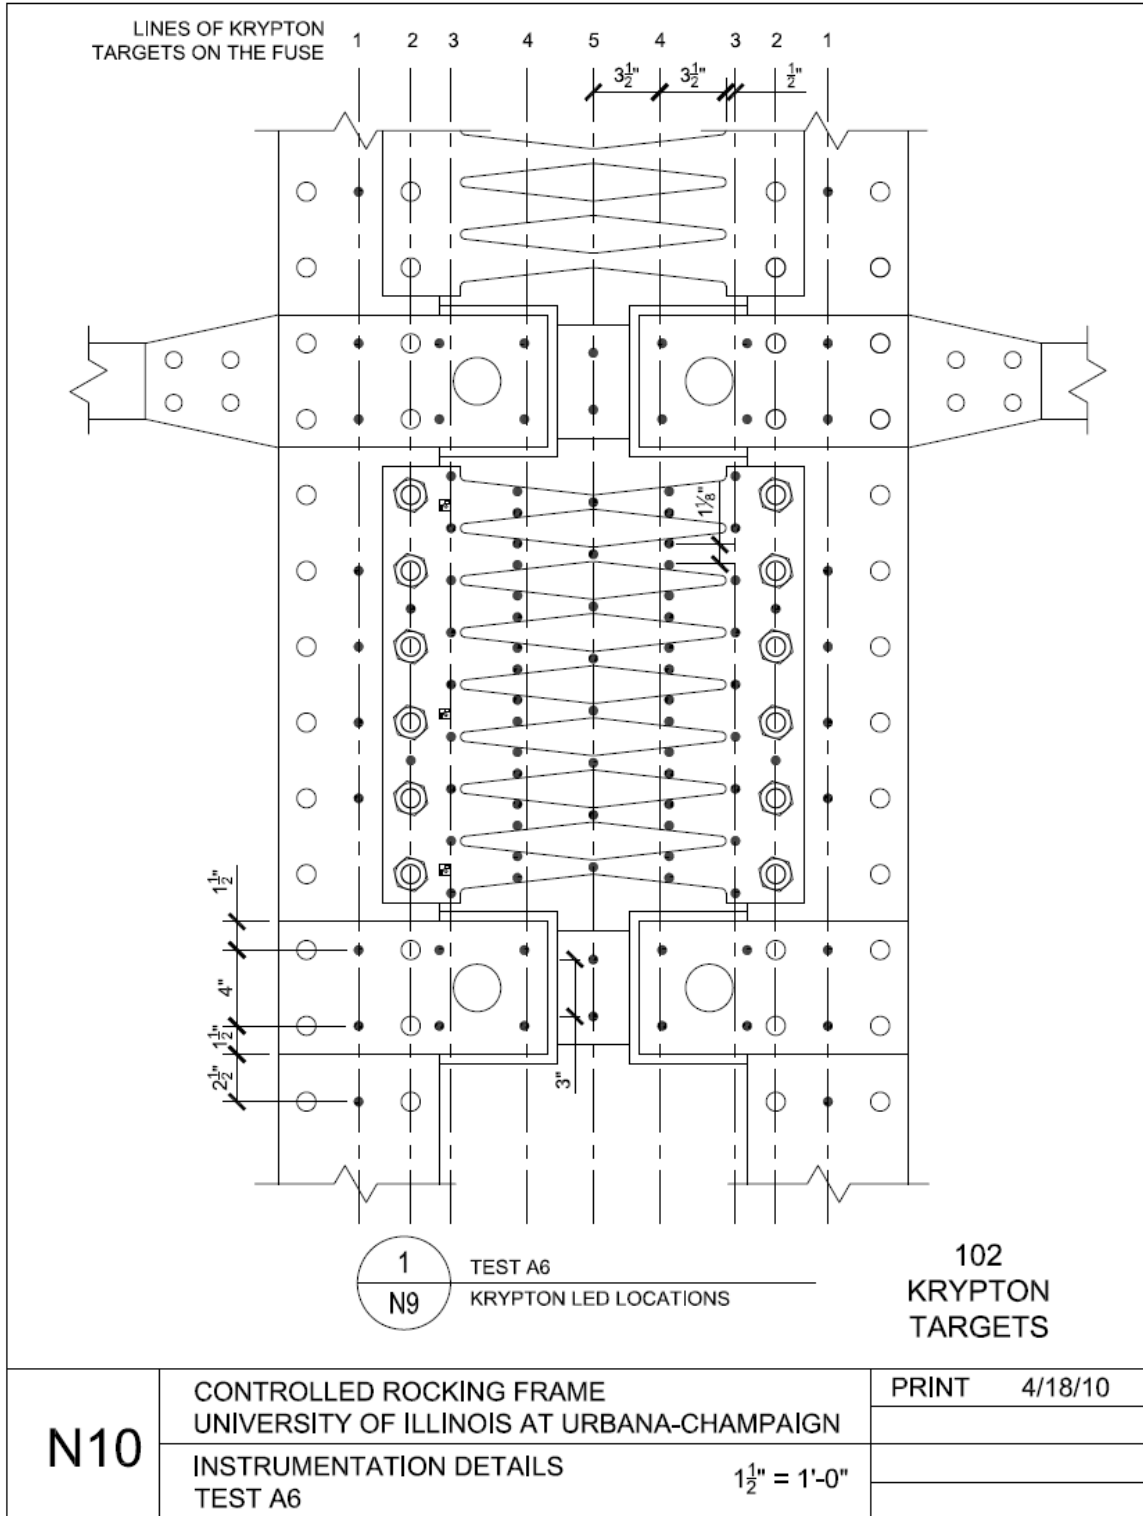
Instrumentation Plan Drawing – Krypton LED’s for Specimen A6
